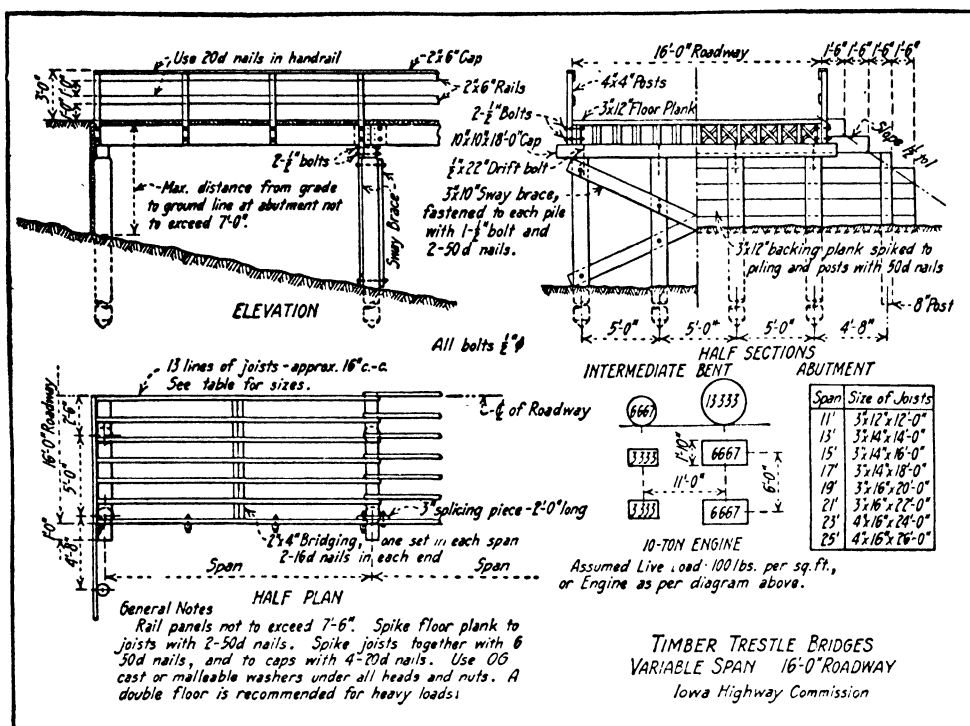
TIMBER TRETTLE BRIDGE. IOWA HIGHWAY COMMISSION.
